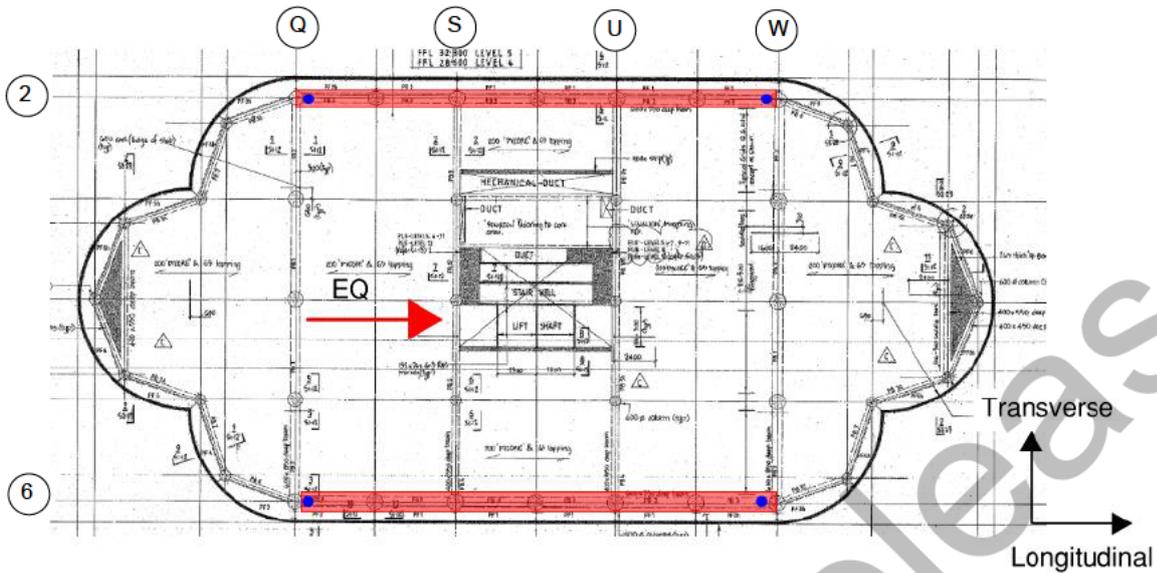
Plan view: Longitudinal vertical lateral resisting elements
